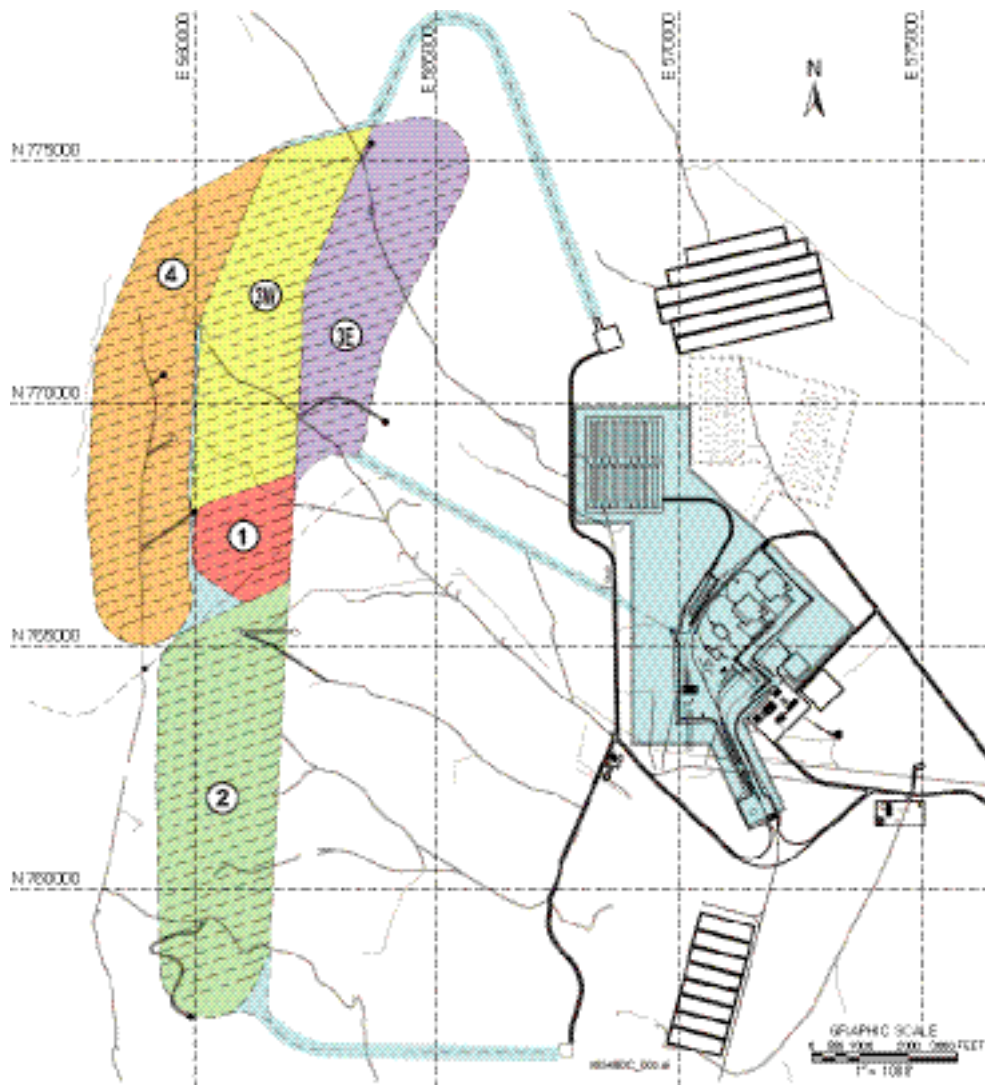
Illustration of underground facility, with emplacement sequencing and general location of surface facilities indicated
